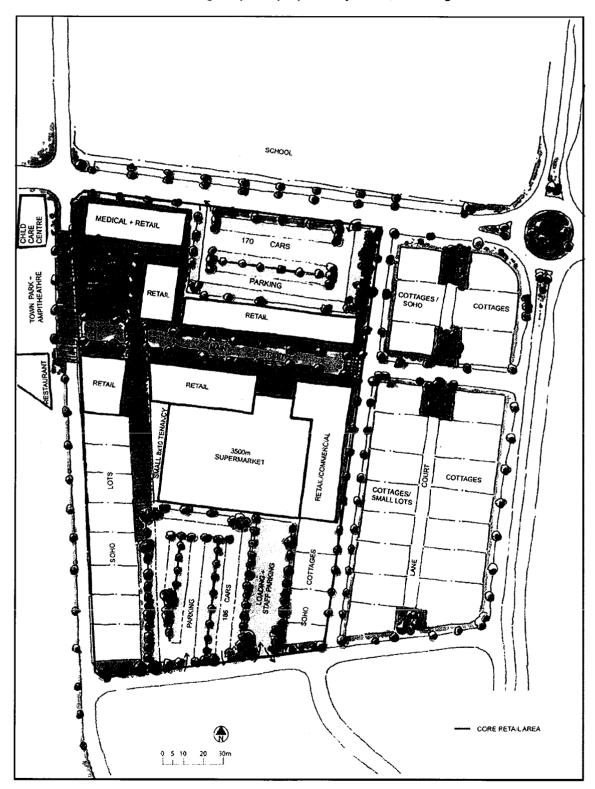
Urbis Indicative Layout Plan for the Chisholm Local Centre Proposal
